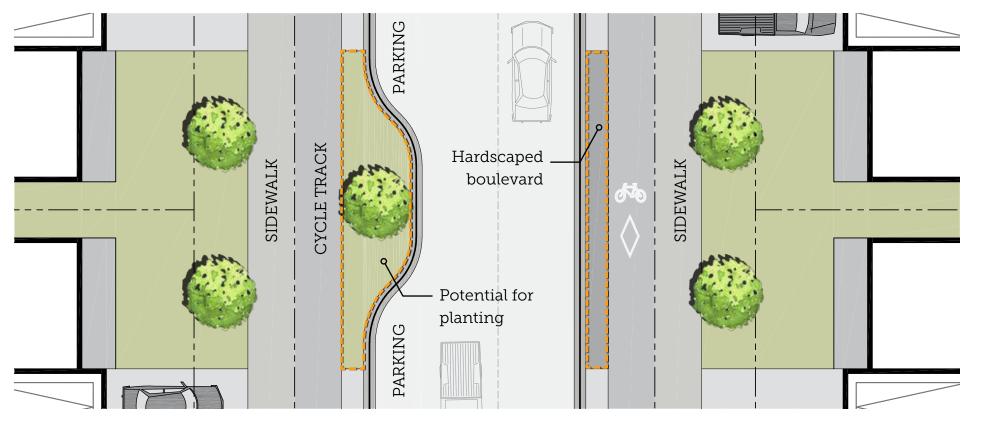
24.0m Collector Road Plan View with Periodic Bulb-Out
